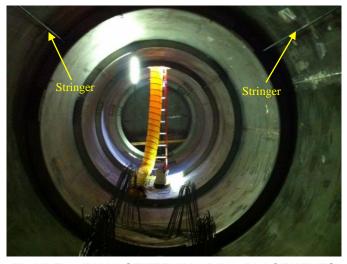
FINAL STIFFENING RING PLACEMENTS WITH STRINGERS
